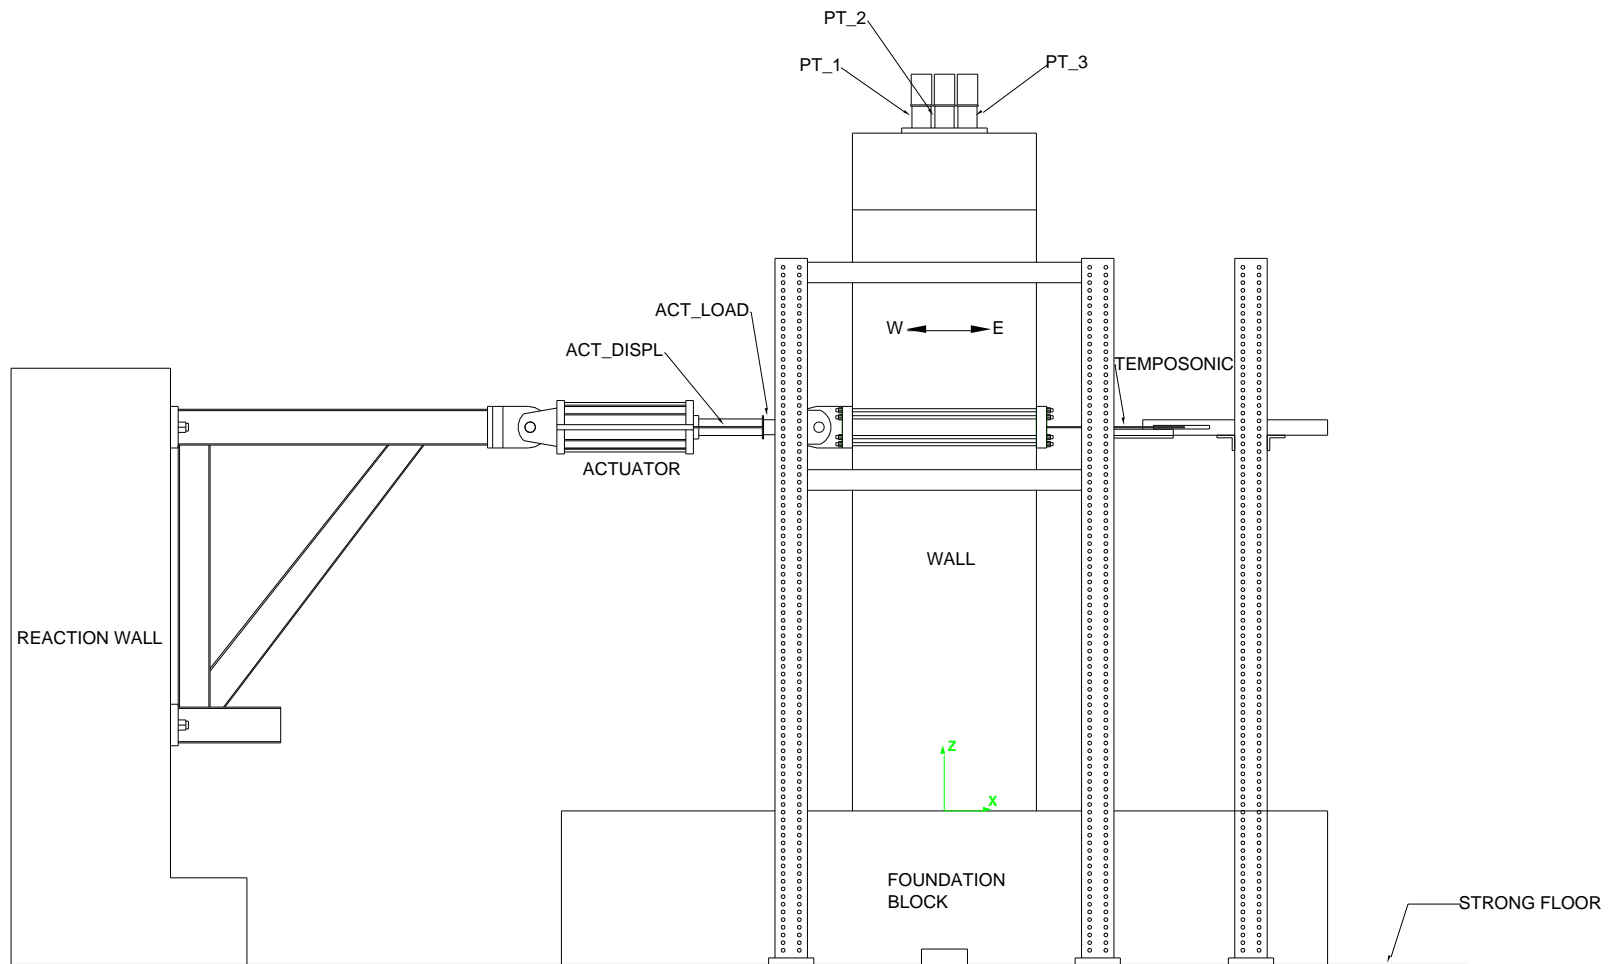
Test set up and locations of load cells and Temposonic transducers for Wall 2 and Wall 3
